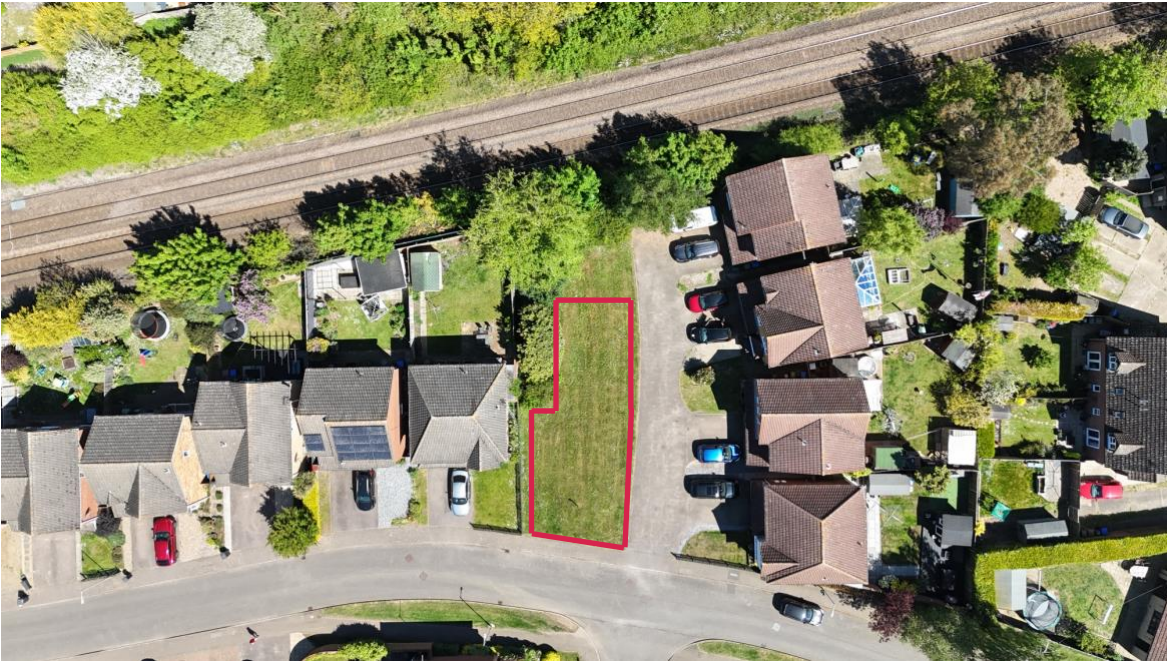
Aerial view of site. Red box shows approximate extent of Proposed Scheme. Looking north.
